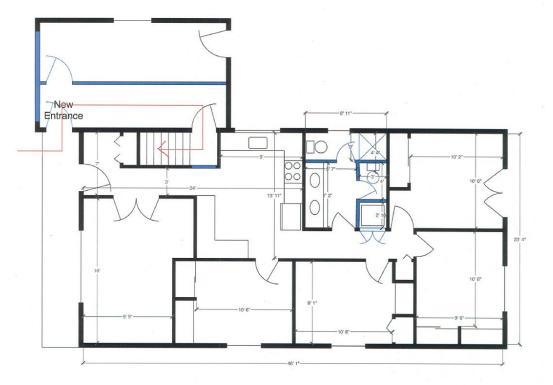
Floor Plan showing proposed new entrance and garage conversion.
